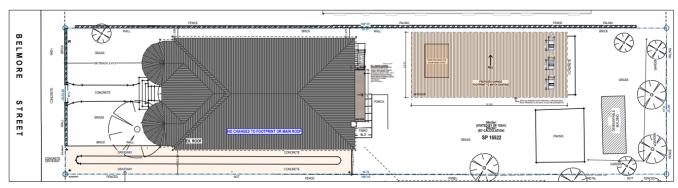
Site Layout indicating areas to be modified highlighted. Source: PlanShop.
